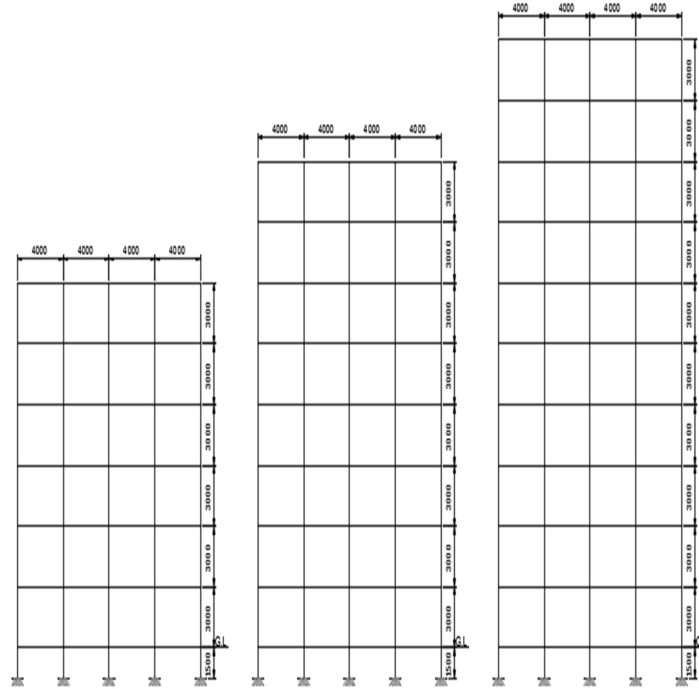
Elevation of 6, 8 & 10 storey bare frame structure
